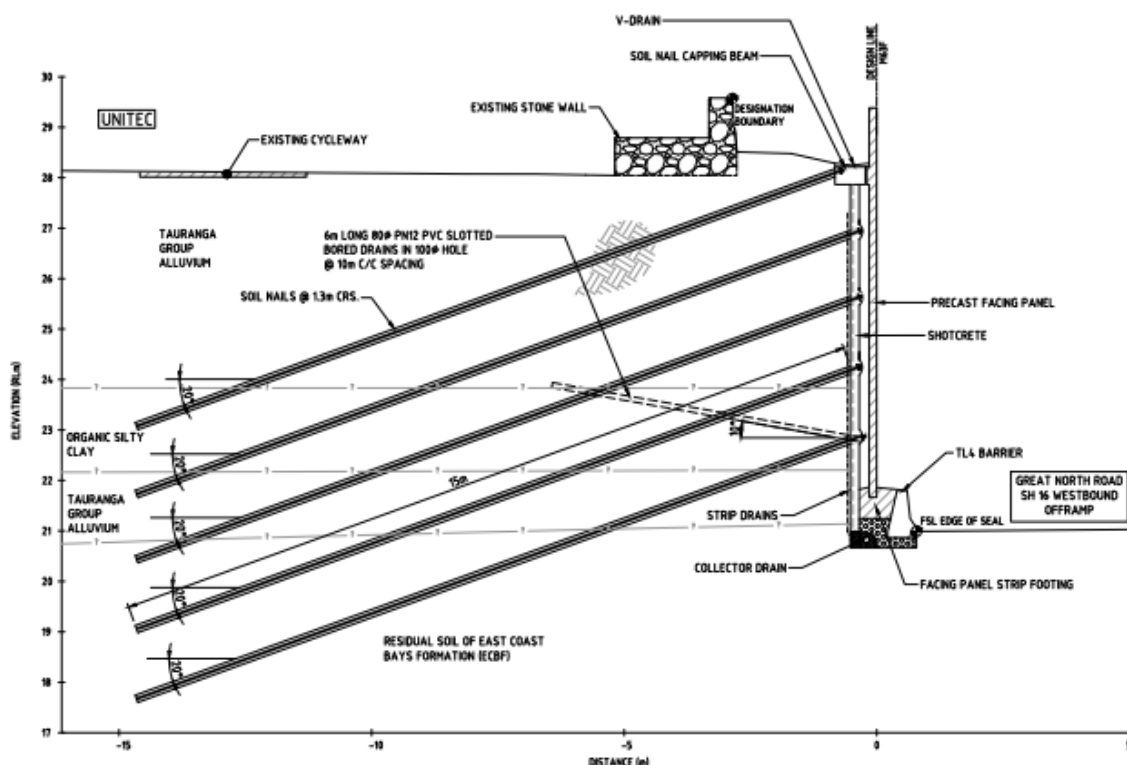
A typical section of soil nail retaining wall with 15 m long nails at 1.3 m spacing
